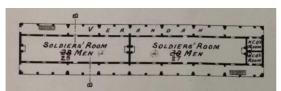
1906 1/F Plan, extracted from the 1906 Whitfield Barracks Skeleton Record Plan, sheet 3/3 (Source: TNA WO78#3744)
